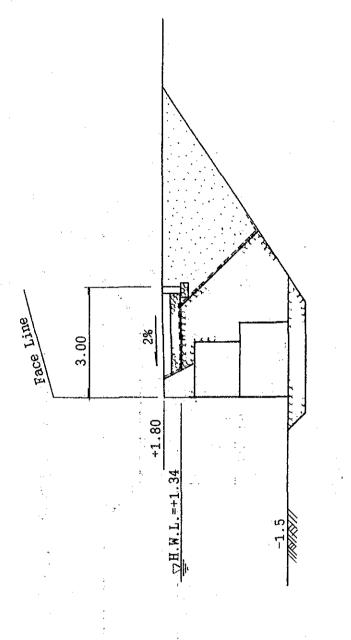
Typical Section of North Coast : Quaywall (S=
